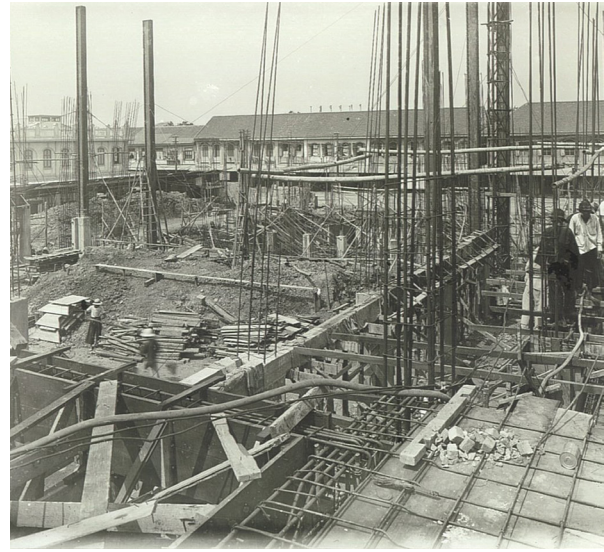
Photo of Construction Site Shows Composite Column, H-profile steel columns encased in concrete (Photo by unknown) © National Archive of Thailand, HWY. 1/1. Digital Files: CFNA01-P0019233-0019.
